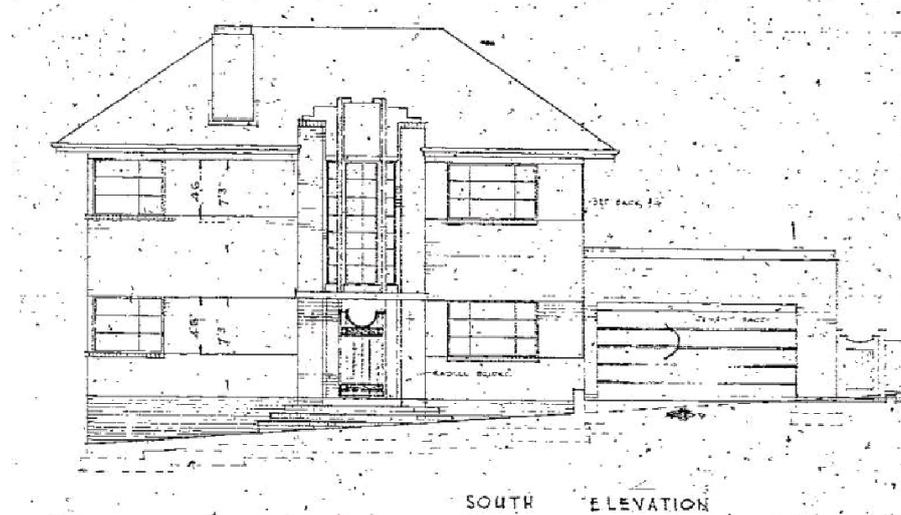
The south elevation, facing Yarrbat Avenue from the original house plans. Note the single-storey form of the garage. (Source: City of Boroondara Building Permit 10142, dated 11 August 1938)
